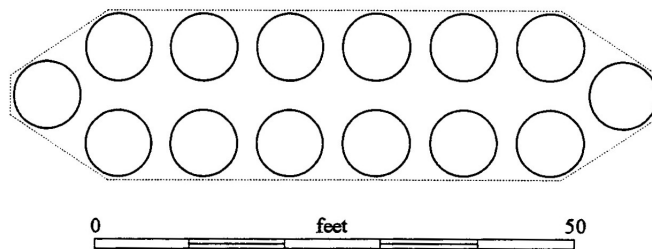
The arrangement of piles supporting the Strood pier of the modern bridge.
